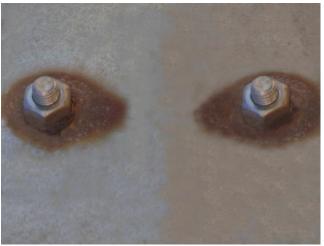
Localized galvanic corrosion of galvanized steel plate due to stainless steel bolts
